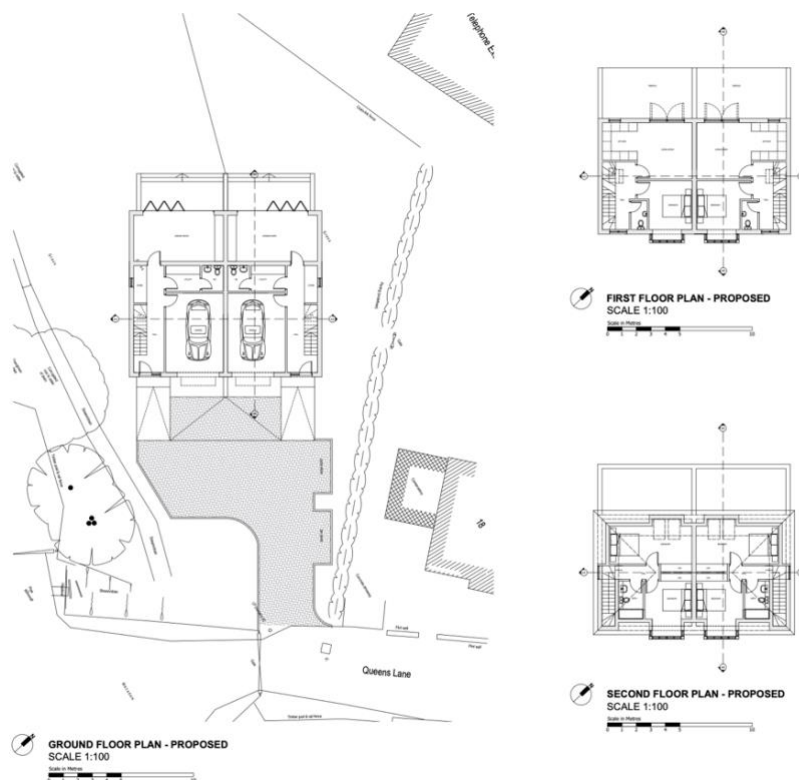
Site plan and floor plans approved under AB/136/21/PL
